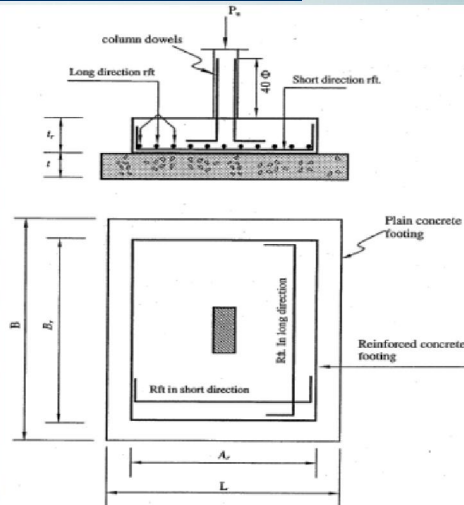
Typical reinforcement and dimensions of isolated footings
